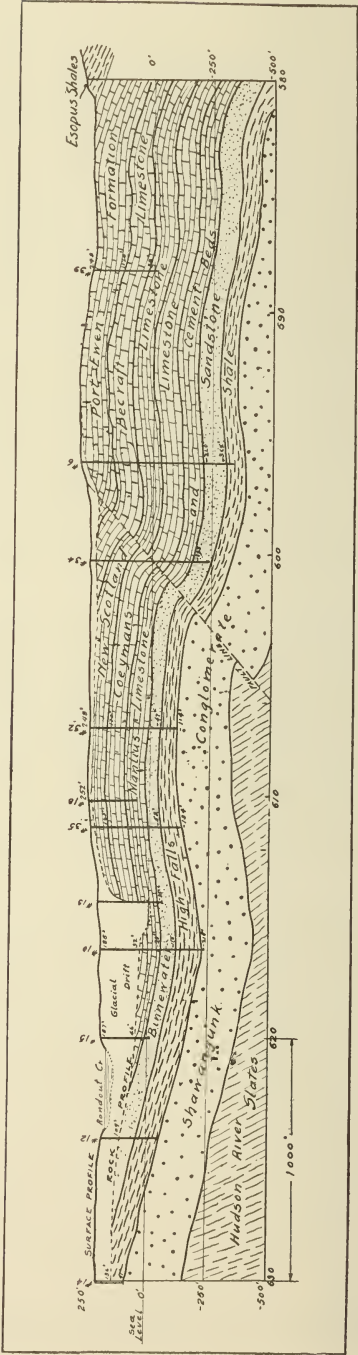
Geologic detail of the central Rondout section constructed from exploratory borings data
